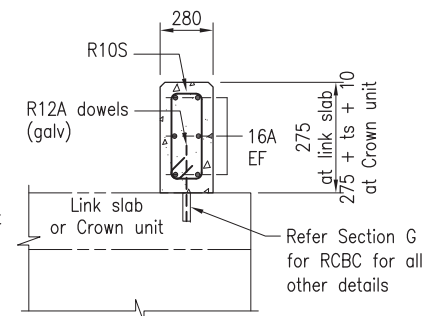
HEADWALL FOR R C BOX CULVERTS
